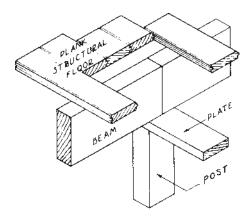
Spaced Beam Bearing at Second Floor Over Interior Post
